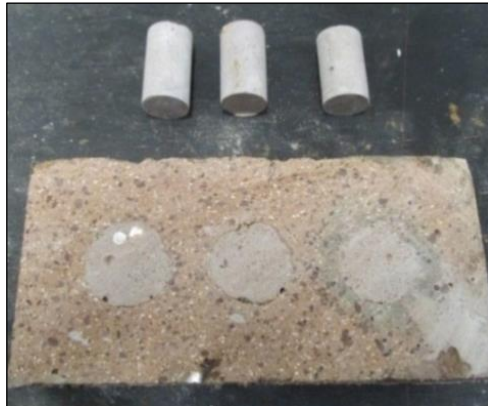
Sectioned brick from wall specimen showing fully-filled voids and cored mortar samples
